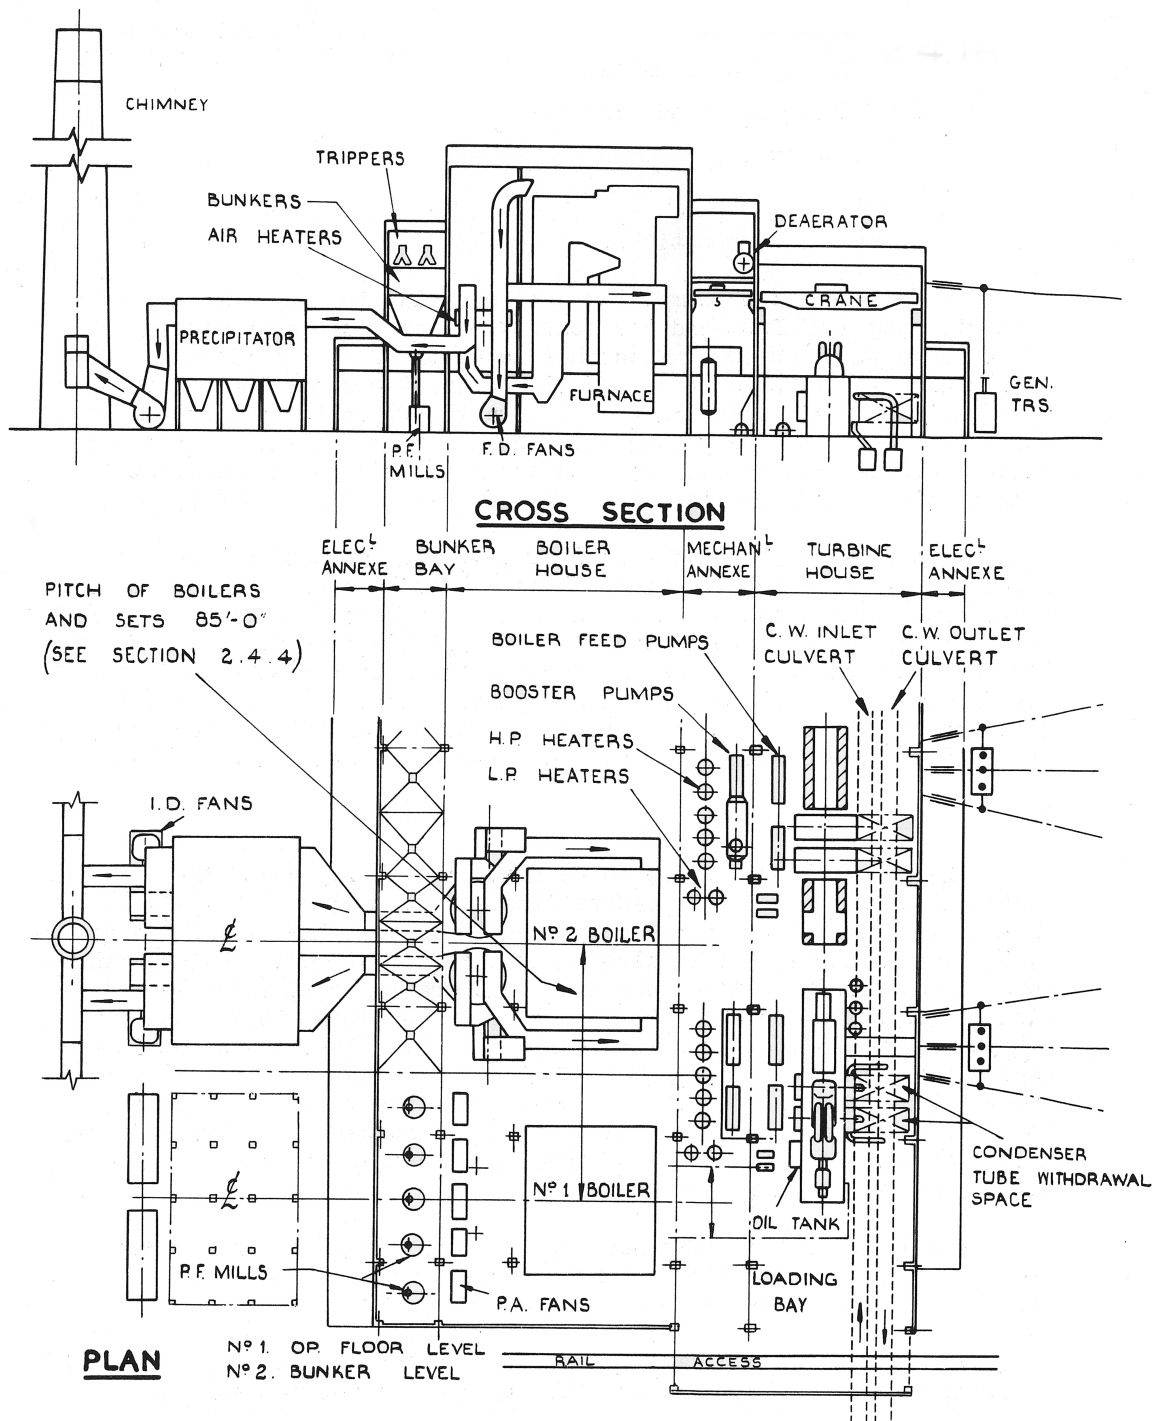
TYPICAL STATION ARRANGEMENT 3 × 120 M.W. UNITS (LONGITUDINAL)
